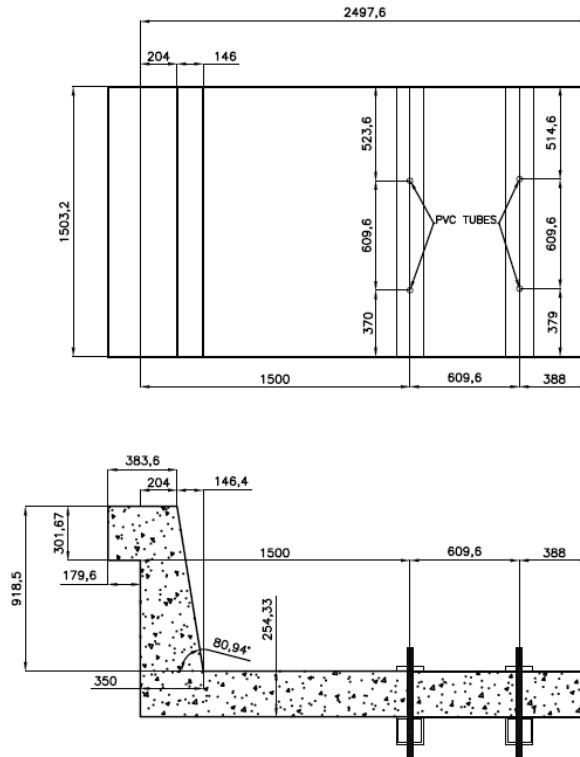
As-built dimensions for SP-03. All dimensions in mm.
